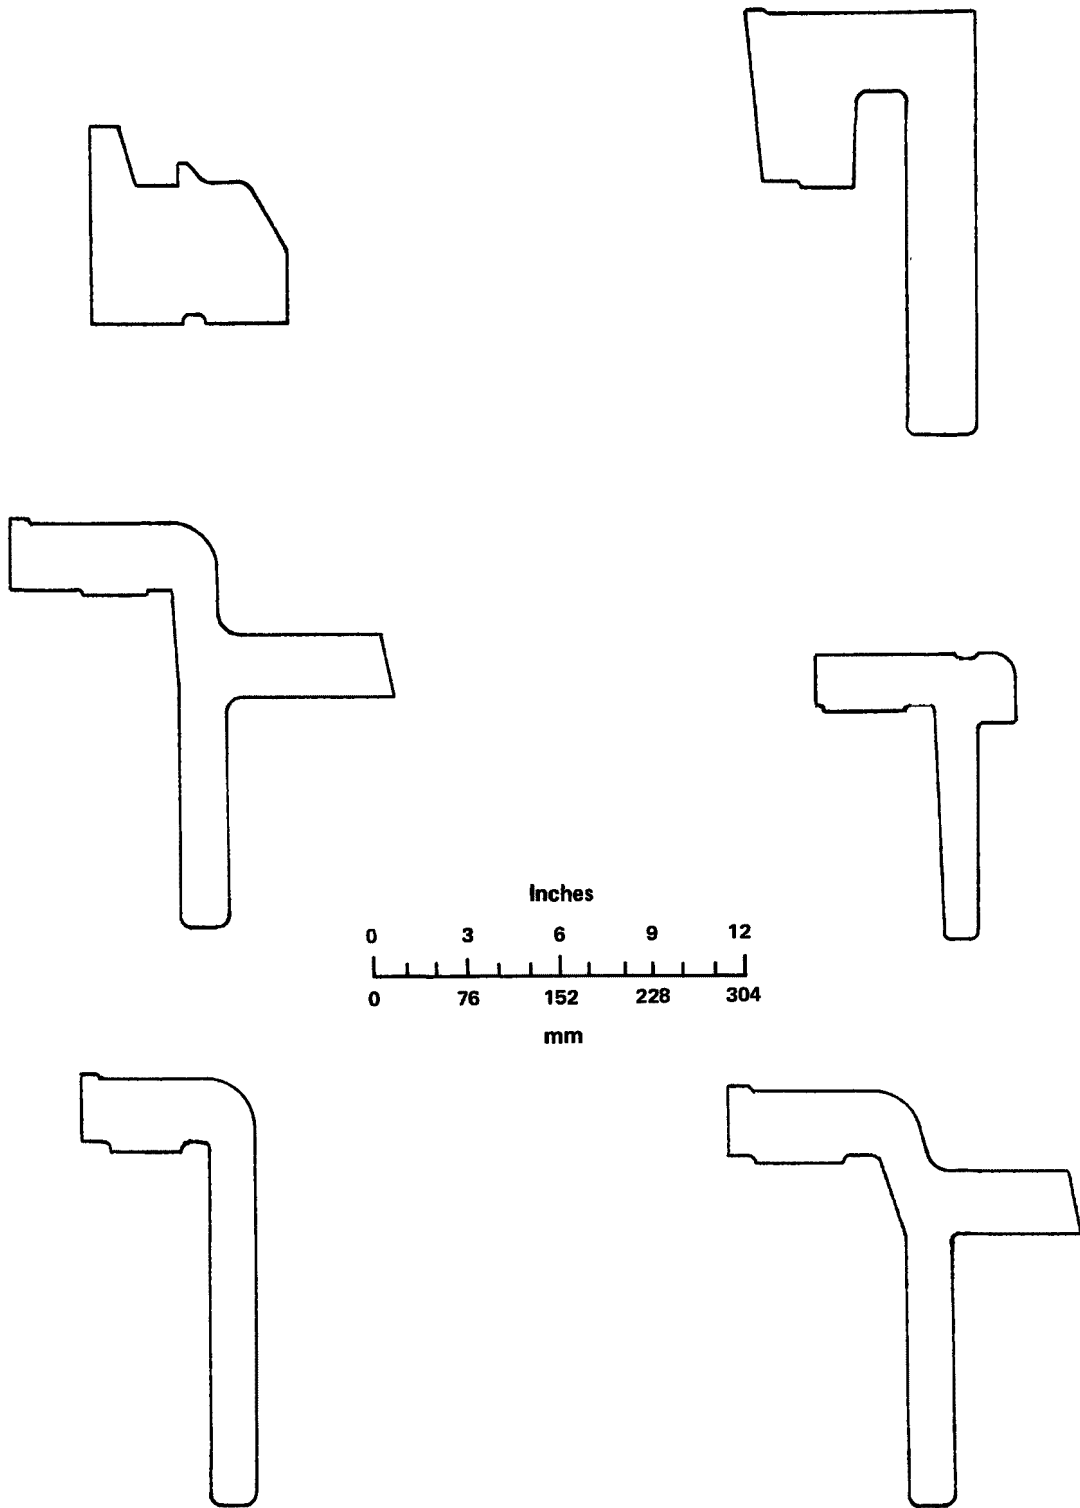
SIX EXAMPLES OF THE HORIZONTAL CROSS SECTION OF EXISTING JAMBS
